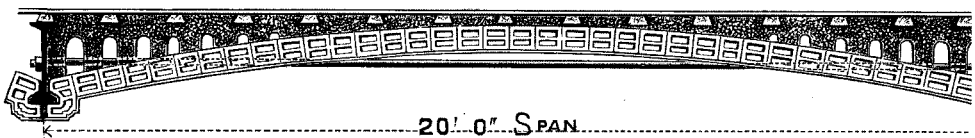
Late nineteenth century hollow tile floor arch (from Pioneer Fire-Proof Construction Co., *Hollow, Solid and Porous Tile for Fire-Proofing Buildings*, 19).
